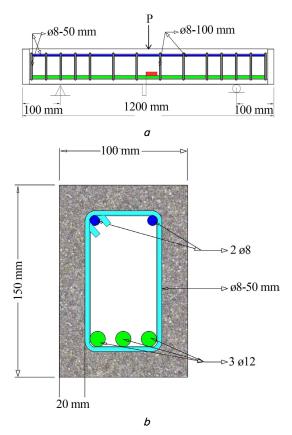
Reinforced concrete (RC) beam: a – dimensions of the RC beam fc' 70 MPa and loading position in the middle for RC beam; b – details reinforcement of the RC beam
